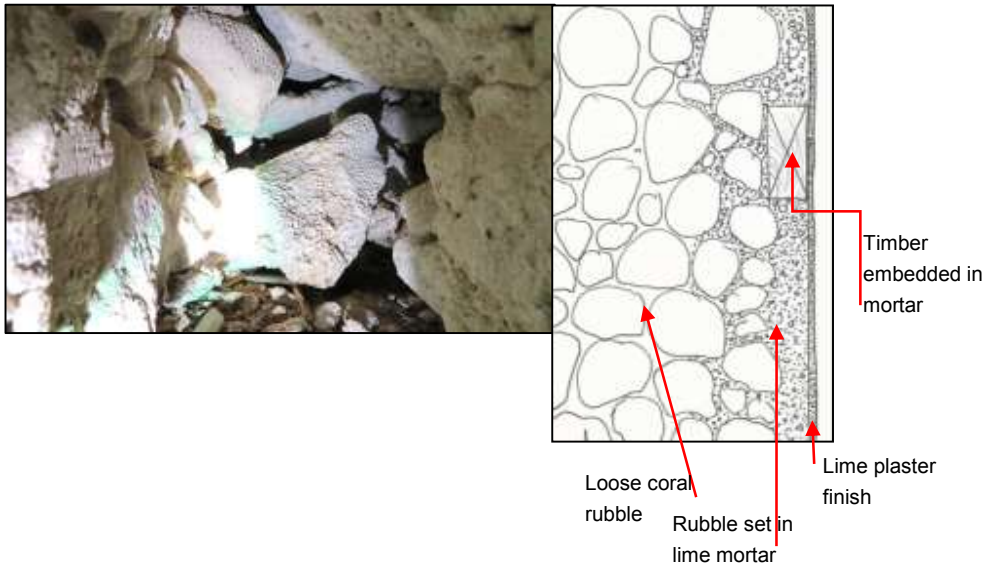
View into wall's interior, with sketch indicating wall construction. Source: Image by author, August 2014.
